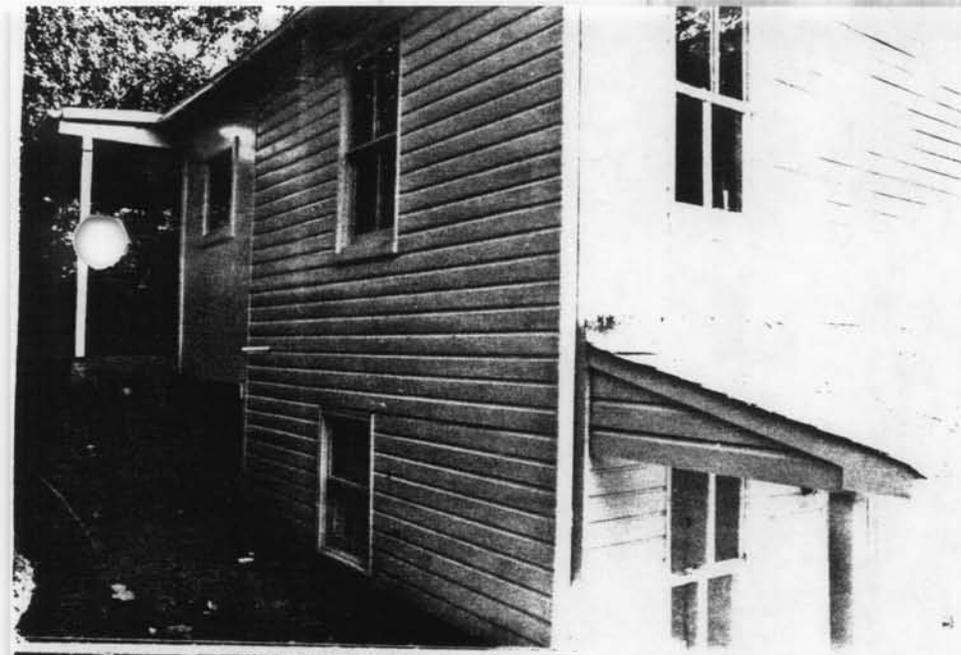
Rear elevation. Partial 1970s porch enclosure was removed. Missing columns installed. Doors repainted.
